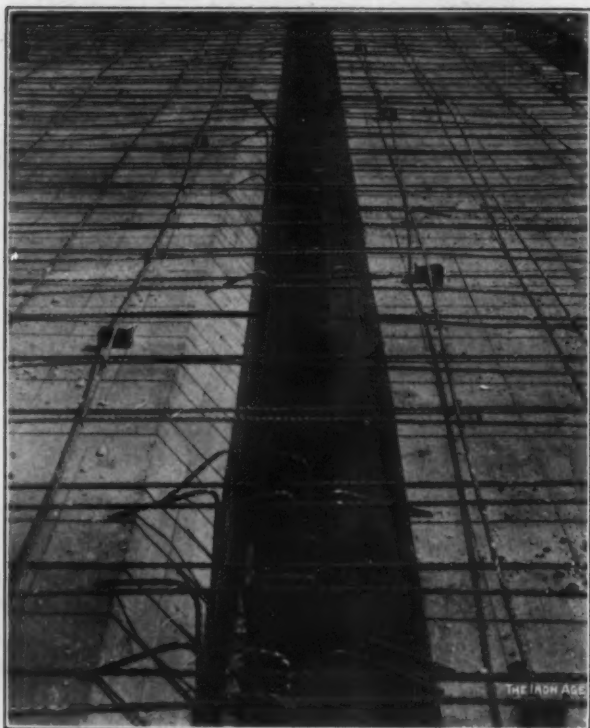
Detail of Floor Construction, with Wooden Forms and Reinforcing in Place.
